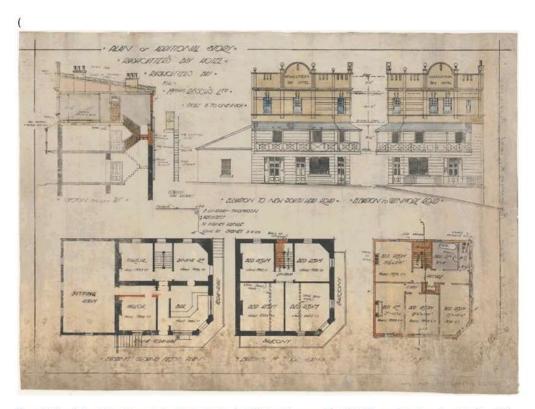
Plan of the additional storey to be added to the hotel by E Lindsay Thompson, May 1909. (Source: State Records and Archives NRS-9590-1-[Plan62948]-[342])
